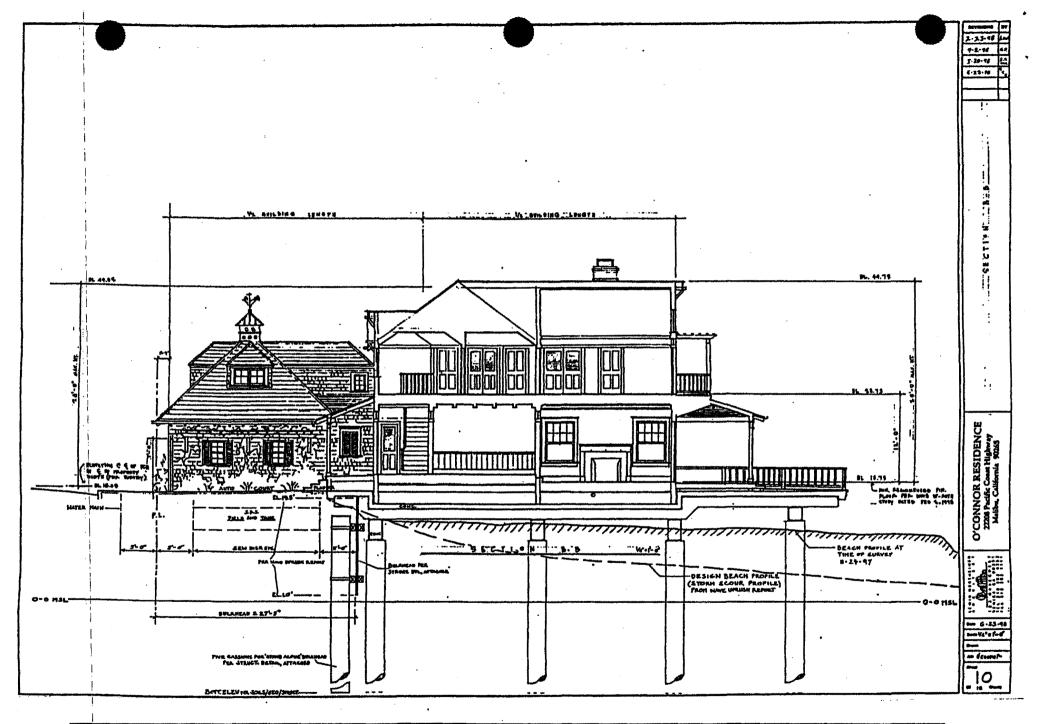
(4-98-158) Cross Section of Project Site
